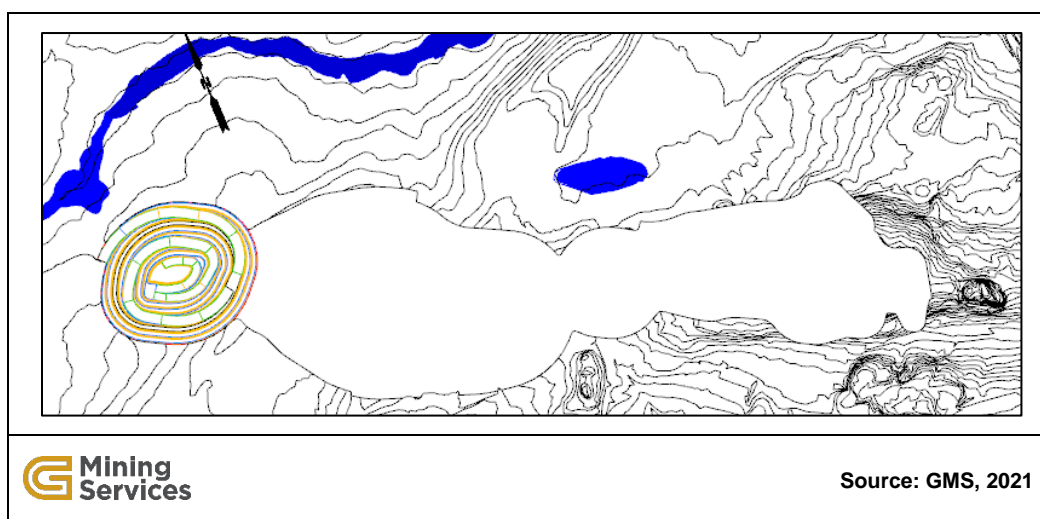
shows JB1-2 extension beyond JB1-1 on all sides, driving deeper. A flat ramp section is incorporated where the JB2-3 and JB1-2 ramps meet to allow the three ramp segments to easily access alternative routes. The JB1-2 ramp exits to the North-West close to the JB1 dump. JB1-2 is 160 m deep, 400 m wide and 400 m long.
